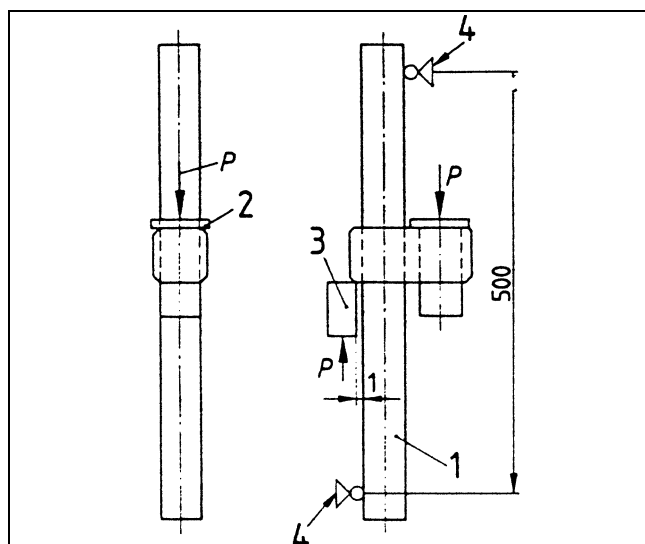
Test apparatus for investigating the behaviour under load of parallel couplers
